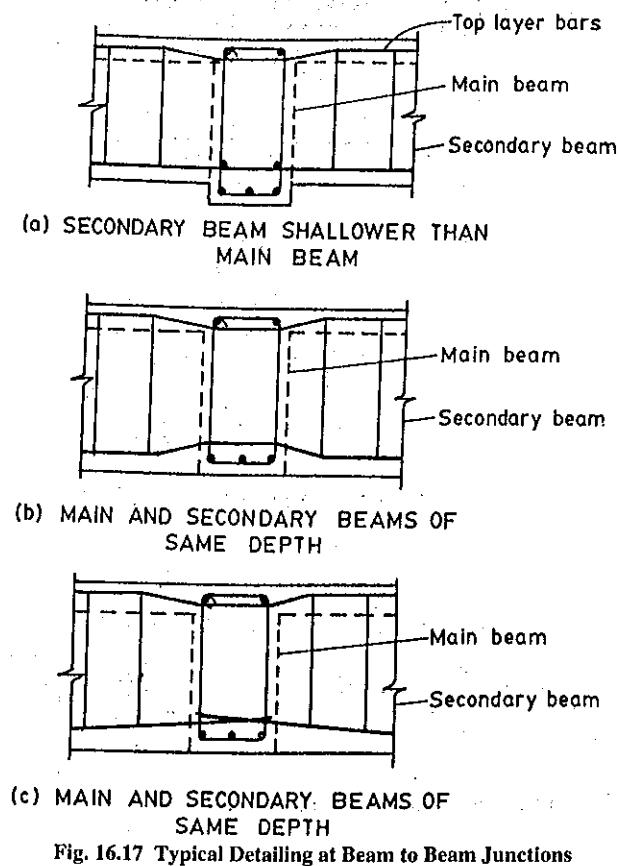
Typical Detailing at Beam to Beam Junctions
